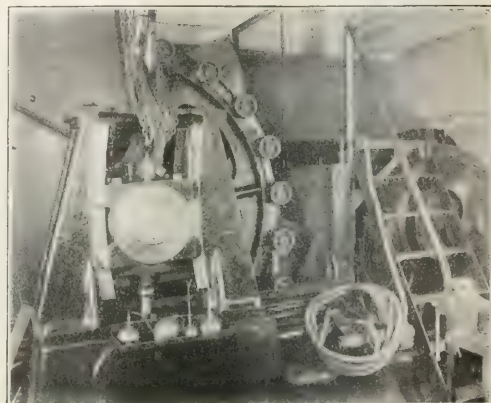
BUCKET LIFT FOR ELEVATING INCOMING MAIL FROM PENNSYLVANIA RAILROAD TRAIN PLATFORM TO BUILDING
